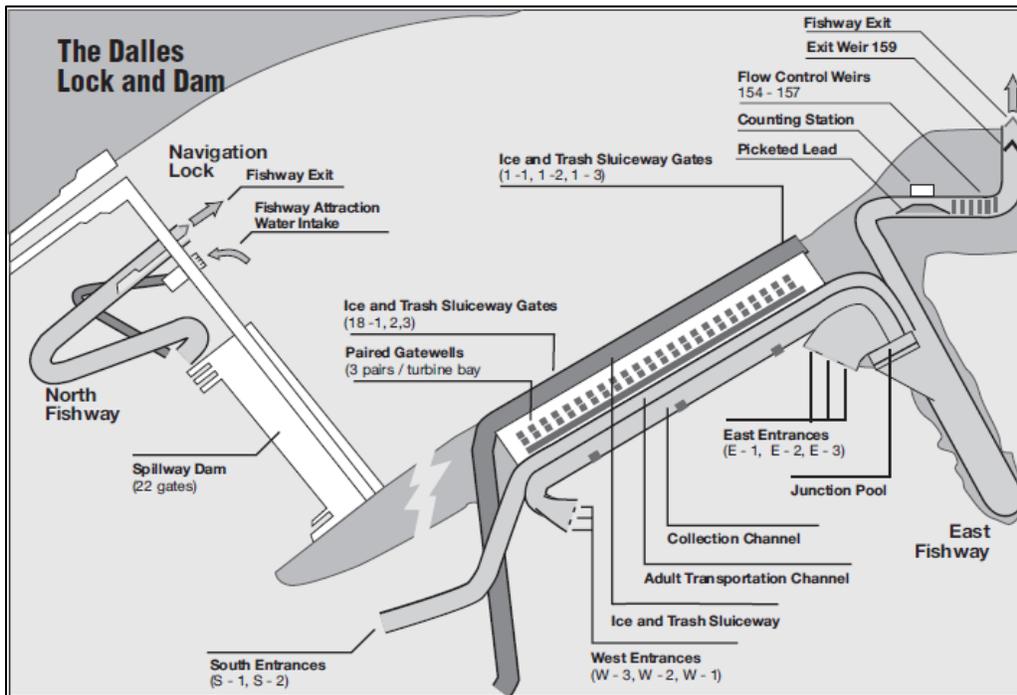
The Dalles Dam Fish Ladder System (USACE 2008)
